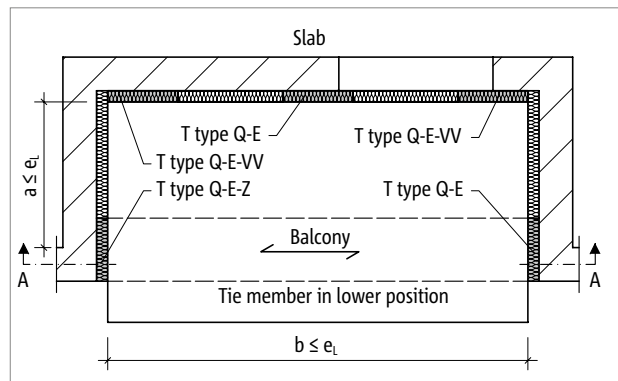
Schöck Isokorb® T type Q-E-Z, Q-E: Layout of recessed balcony
